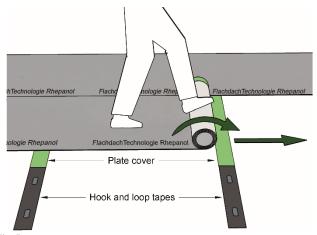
Illustration of Rhepanol® hfk used with Rhepanol Gripfix System. Rhepanol® hfk is rolled out transversally across the Rhepanol Gripfix hook and loop tapes. During installation of the roofing the hook and loop tapes are covered with plates. Once the roofing membrane is aligned the plates are removed to allow the membrane's fleece backing to attach to the hook and loop tapes.
